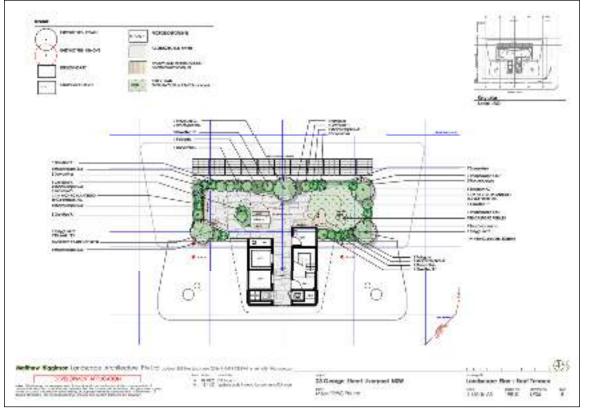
Roof Terrace/Landscape Plan (source: LP06-G prepared by Matthew Higgins Landscape Architecture).
